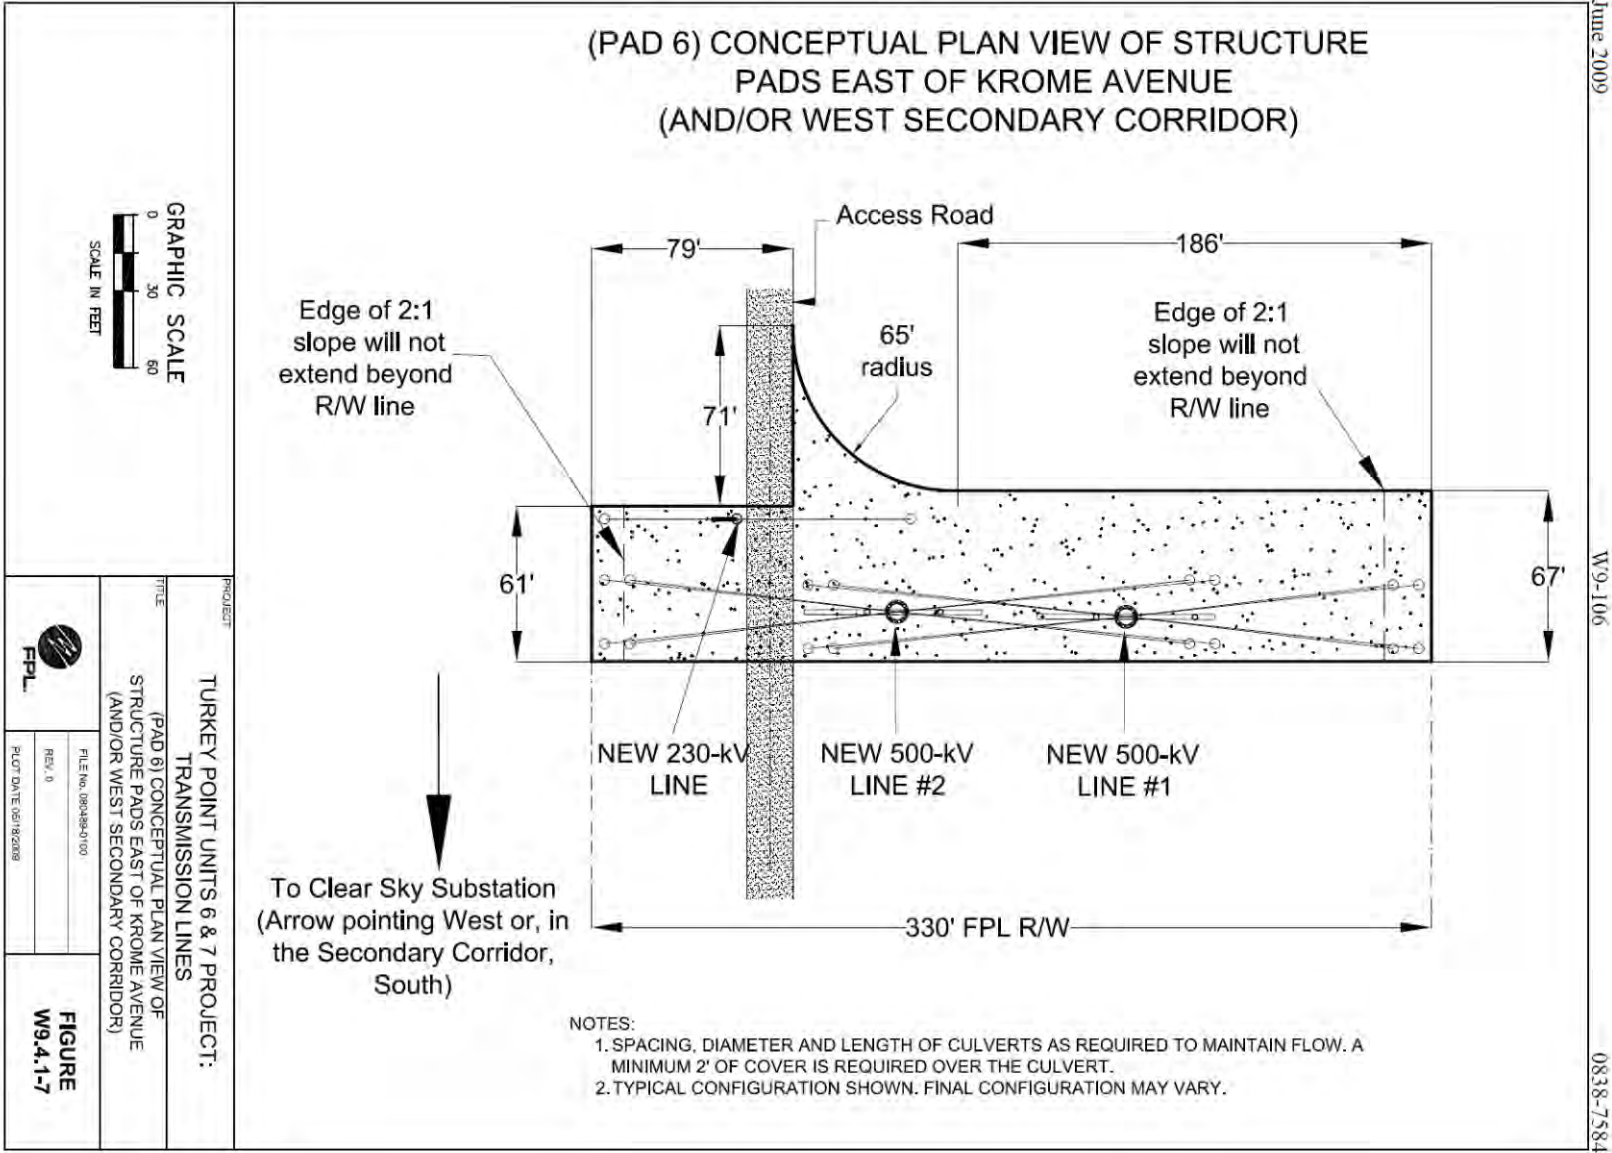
(PAD 6) CONCEPTUAL PLAN VIEW OF STRUCTURE PADS EAST OF KROME AVENUE
